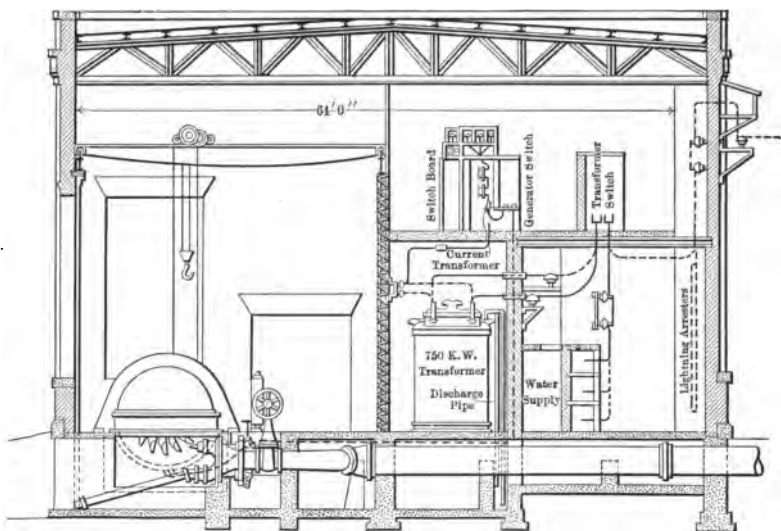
CROSS-SECTION OF POWER-HOUSE.
